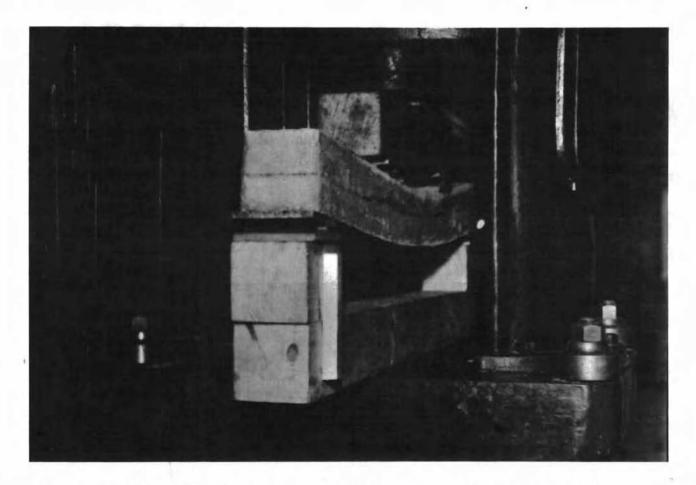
Deflection of reinforced beam under test - about 1 in. Final value about  $1\frac{1}{2}$  in. Note ice seam at top of first 2-in. layer and frozen eruption of water near one third point of span.
